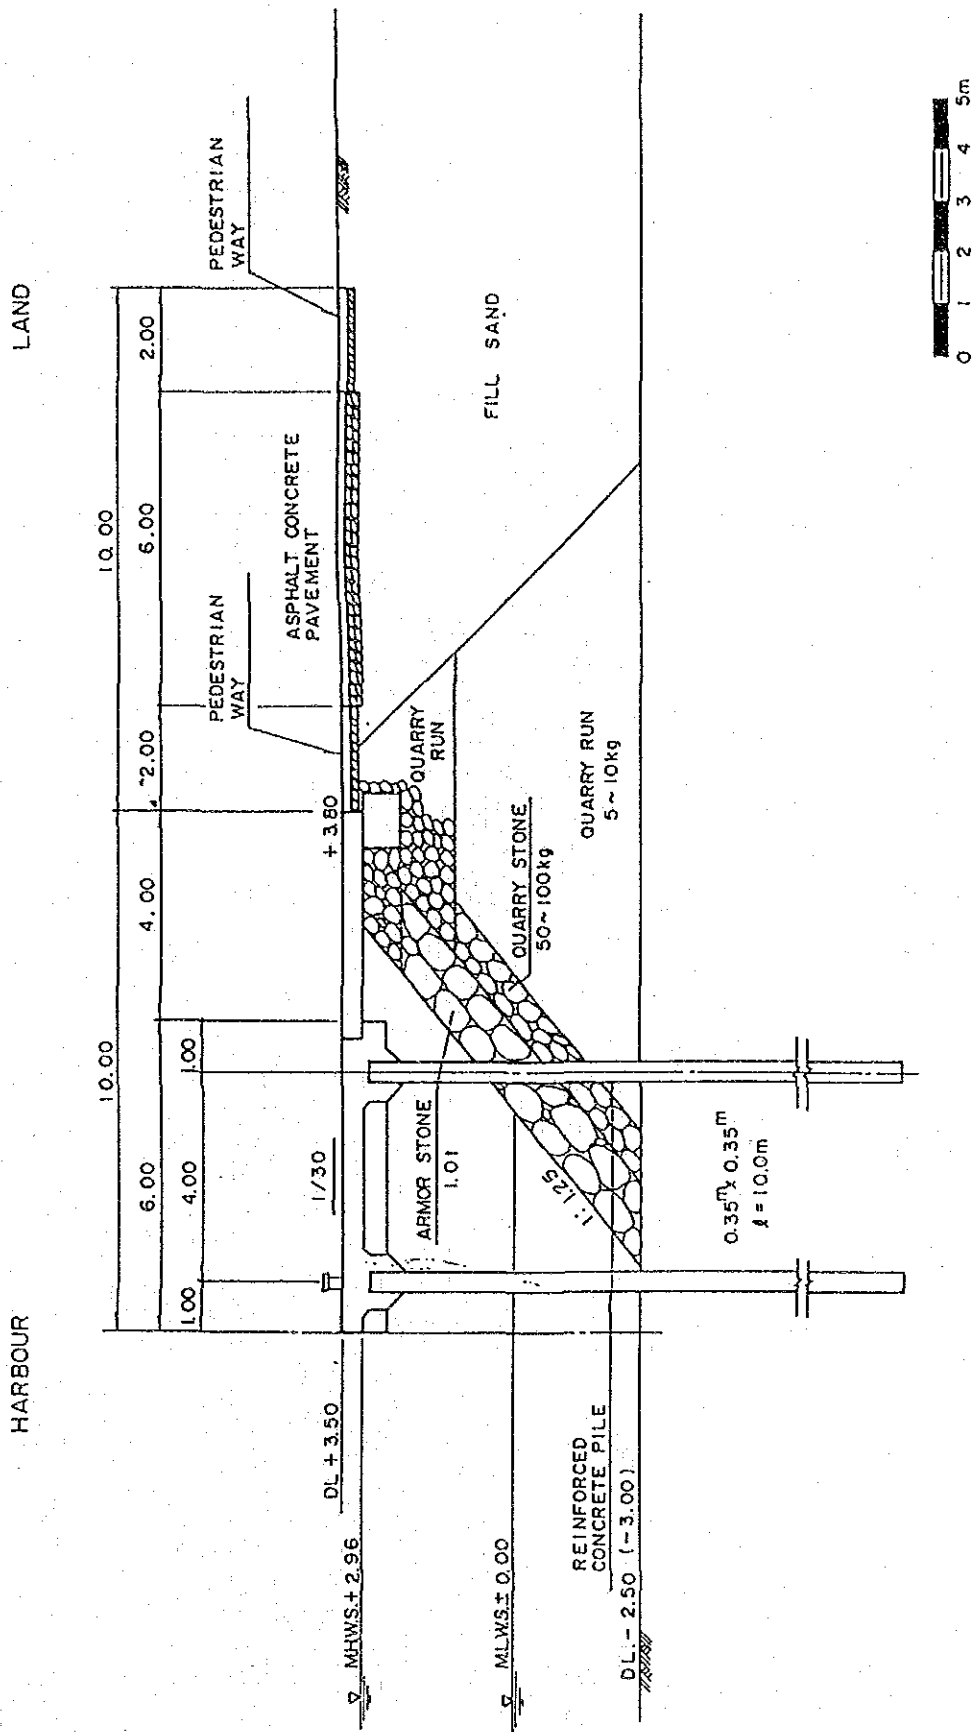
(1) Typical Cross Section of Breakwater(1)
